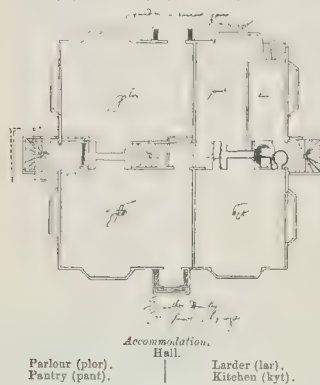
Plan, by John Thorpe, of a House for Sir Walter Raleigh, St. James.
